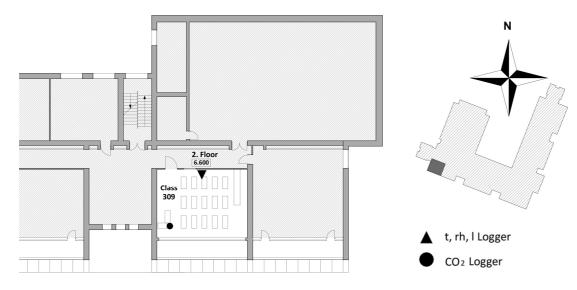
Locations of the sensors in Classroom 309 on the plan. Source: Own
